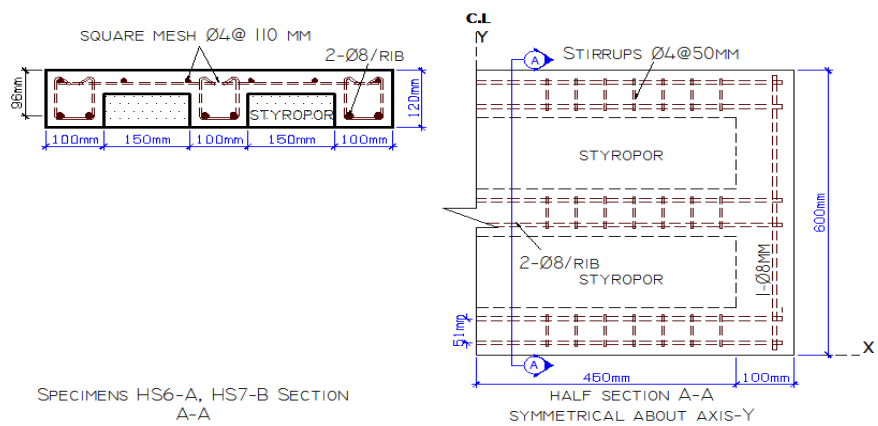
Reinforcement details of specimens HS6-A and HS7-B
